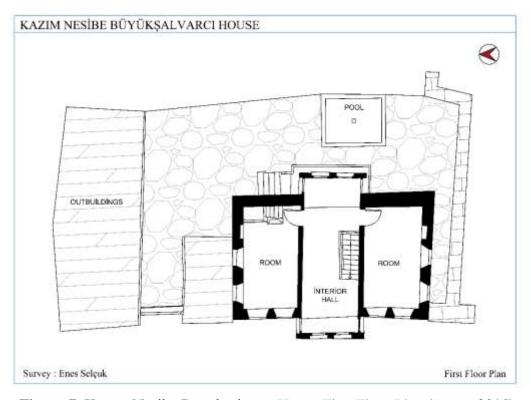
Kazım-Nesibe Büyükşalvarcı House First Floor Plan (Aygör, 2015)
